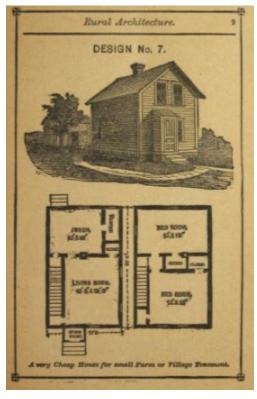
Ogilvie's House Plans circa 1885, 25 cents.
